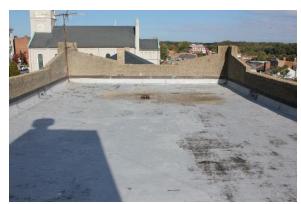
, Old Jail, roof, view of higher flat membrane roof looking south. Note the parapets.
